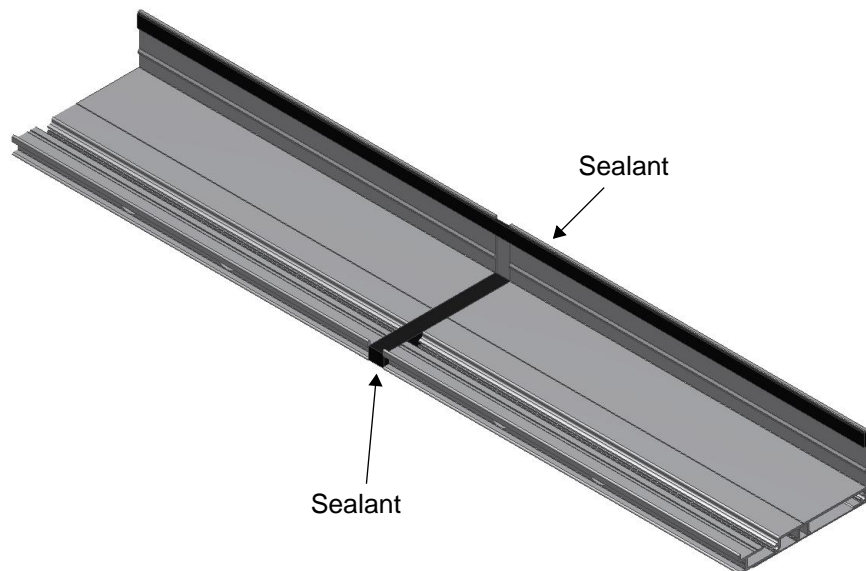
Apply sealant between the two pieces of sill flashing spanning the splice joint.
